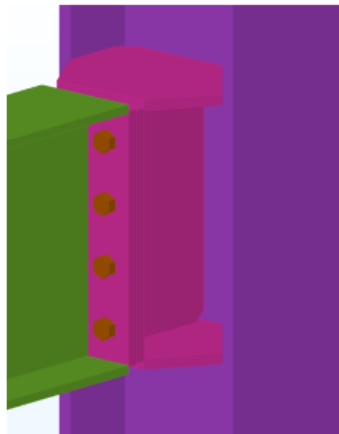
Welded part for weak axis flush end plate joints (bolt pattern not representative)
